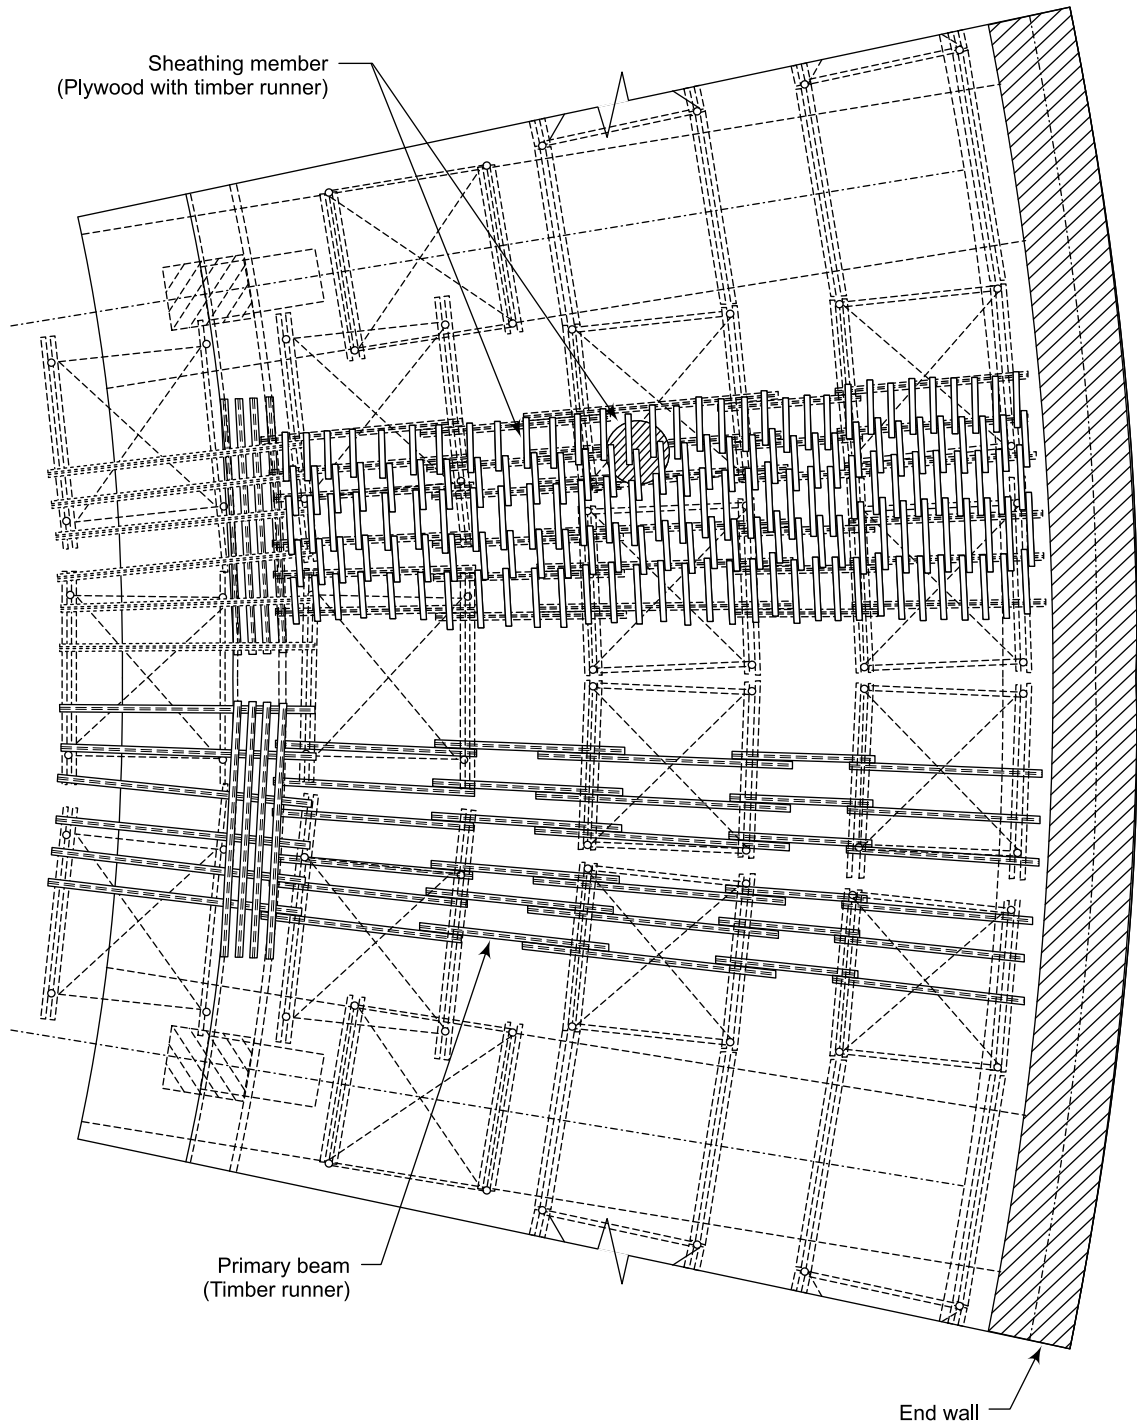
Part Plan Showing Bottom Shutter Arrangement.
